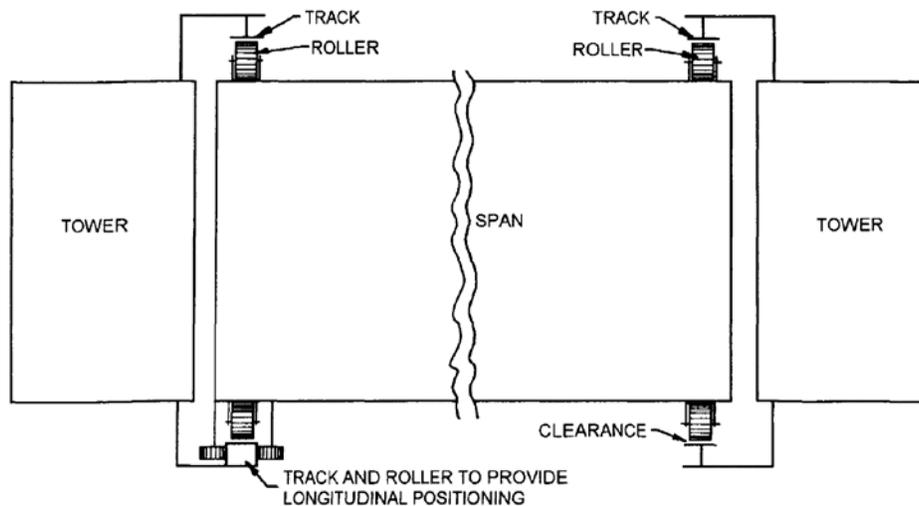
Schematic of typical span-guide rollers; sliding-type guides are also used
